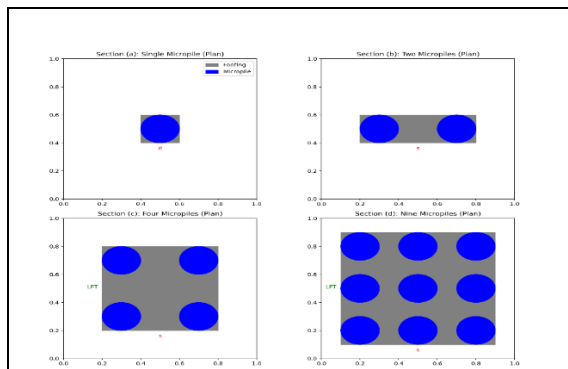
Diagram showing four sections of micropile arrangements in a footing plan.
